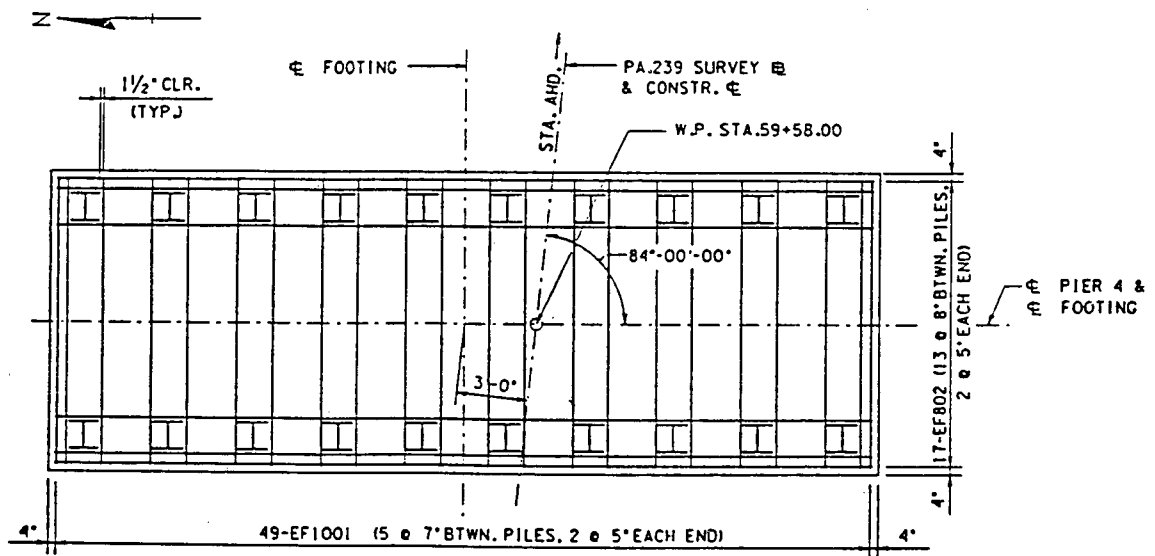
DETAILS SHOW STEEL PILES. DETAILS FOR TIMBER
